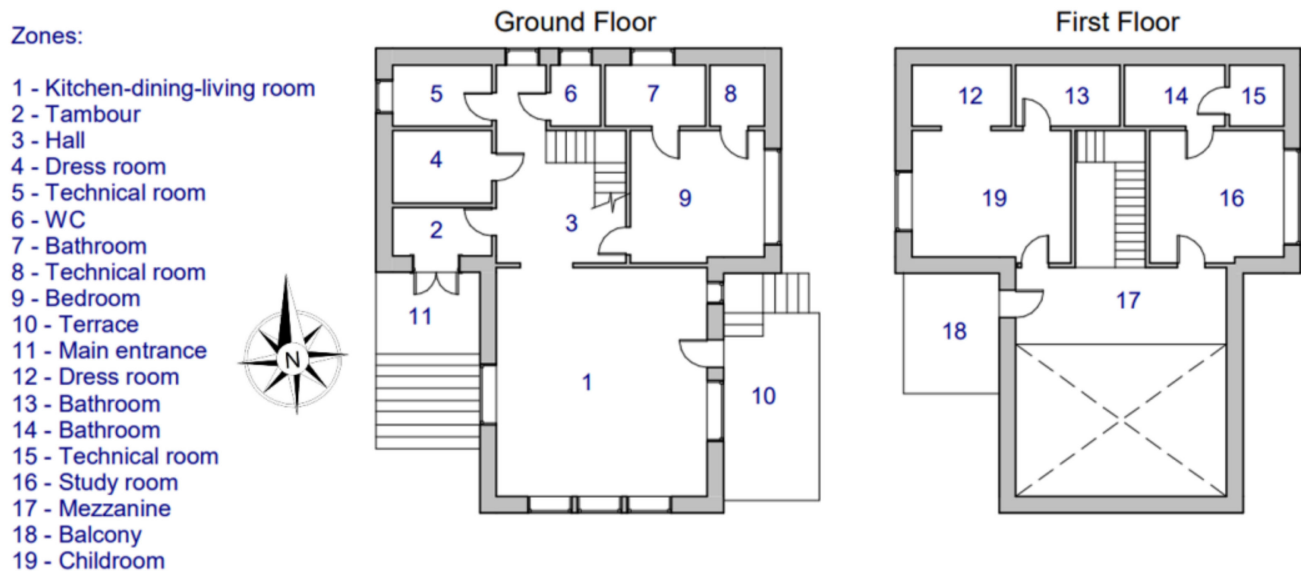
Floor plans of the Detached house in a cold climate (Case Study 1) [86].
